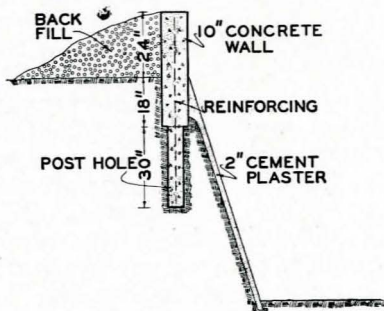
A 2-inch plastered wall with 10-inch reinforced concrete wall above.
